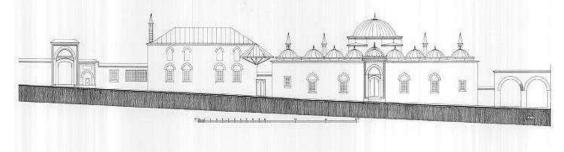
Facade of themadrasatowardsthe Sami Paşa Street, afterrestoration (Archives of Directorate of Foundations, repairrecords, 1960)
